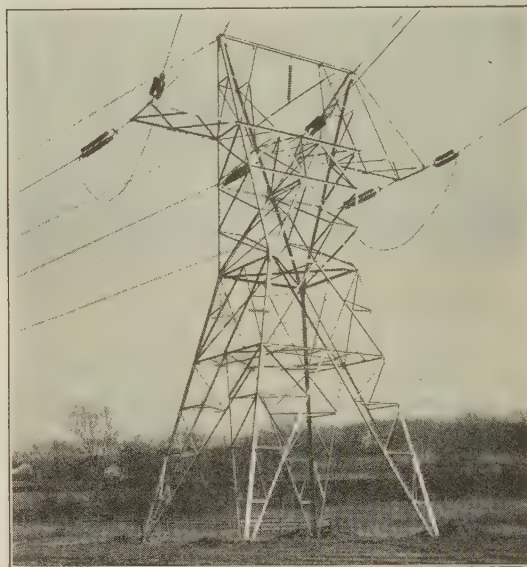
DEAD-END TOWER AND JUMPER CONSTRUCTION
